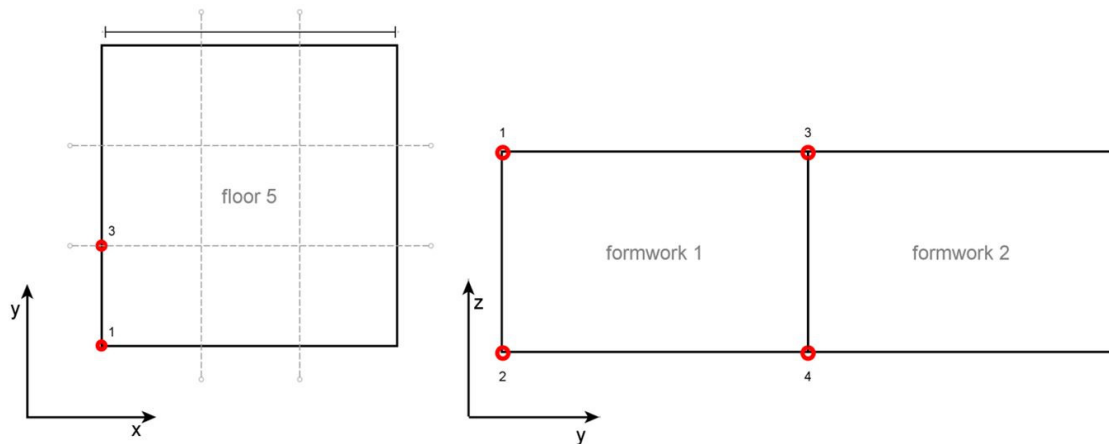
Top view (left) and side view (right) of formwork for one floor
